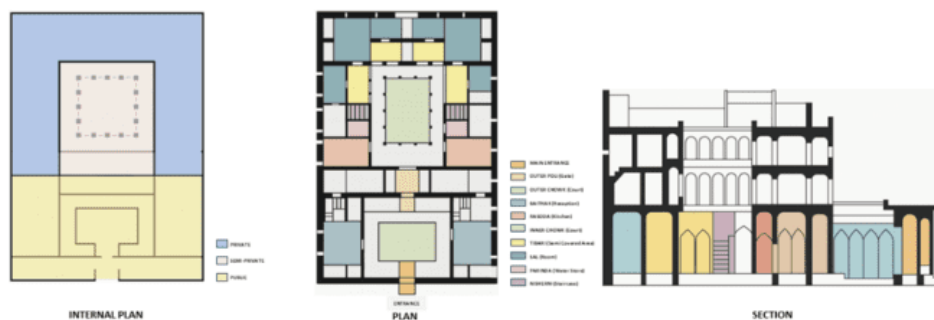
Internal plan, overall plan, and sectional view of a traditional Haveli in Mandawa
